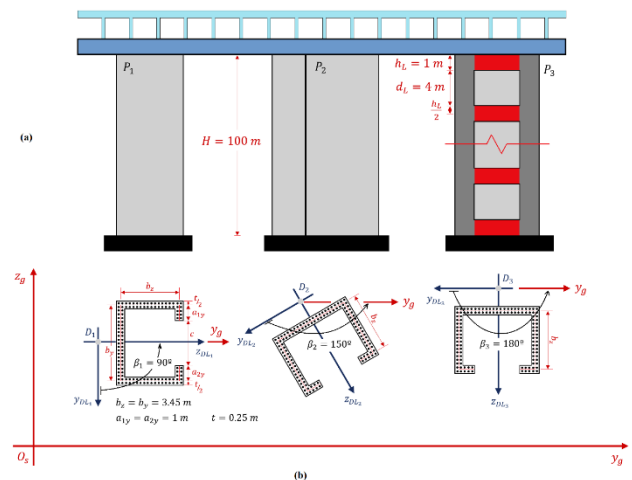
Bridge backed over three thin-walled pillars: (a) lateral view, (b) drawing configuration of the pillars
